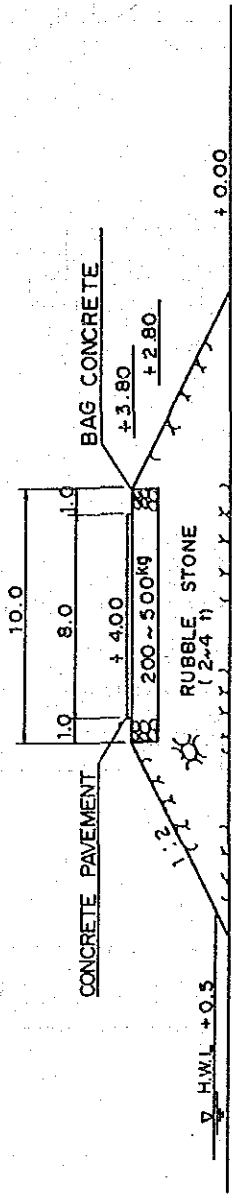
(A-t) ㉕ FIFYOS RIVER IMPROVEMENT PLAN (PLAN A AND B) (Unit; m)
